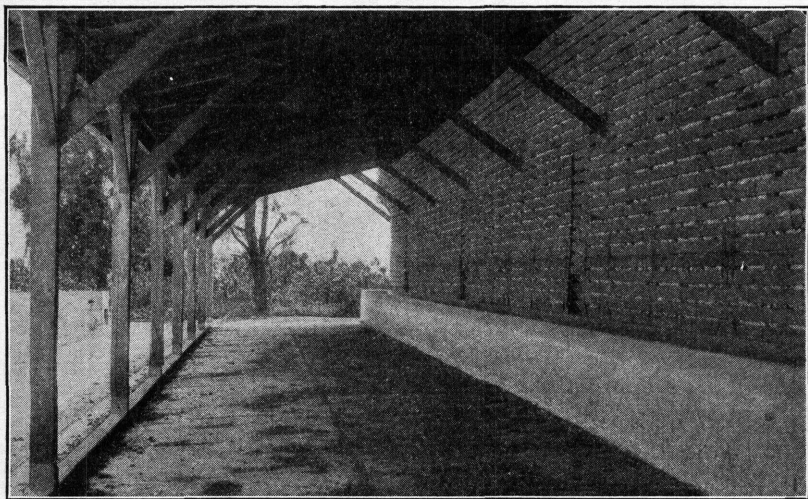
An open feeding shed adjoining corn storage does not obstruct ventilation of crib
